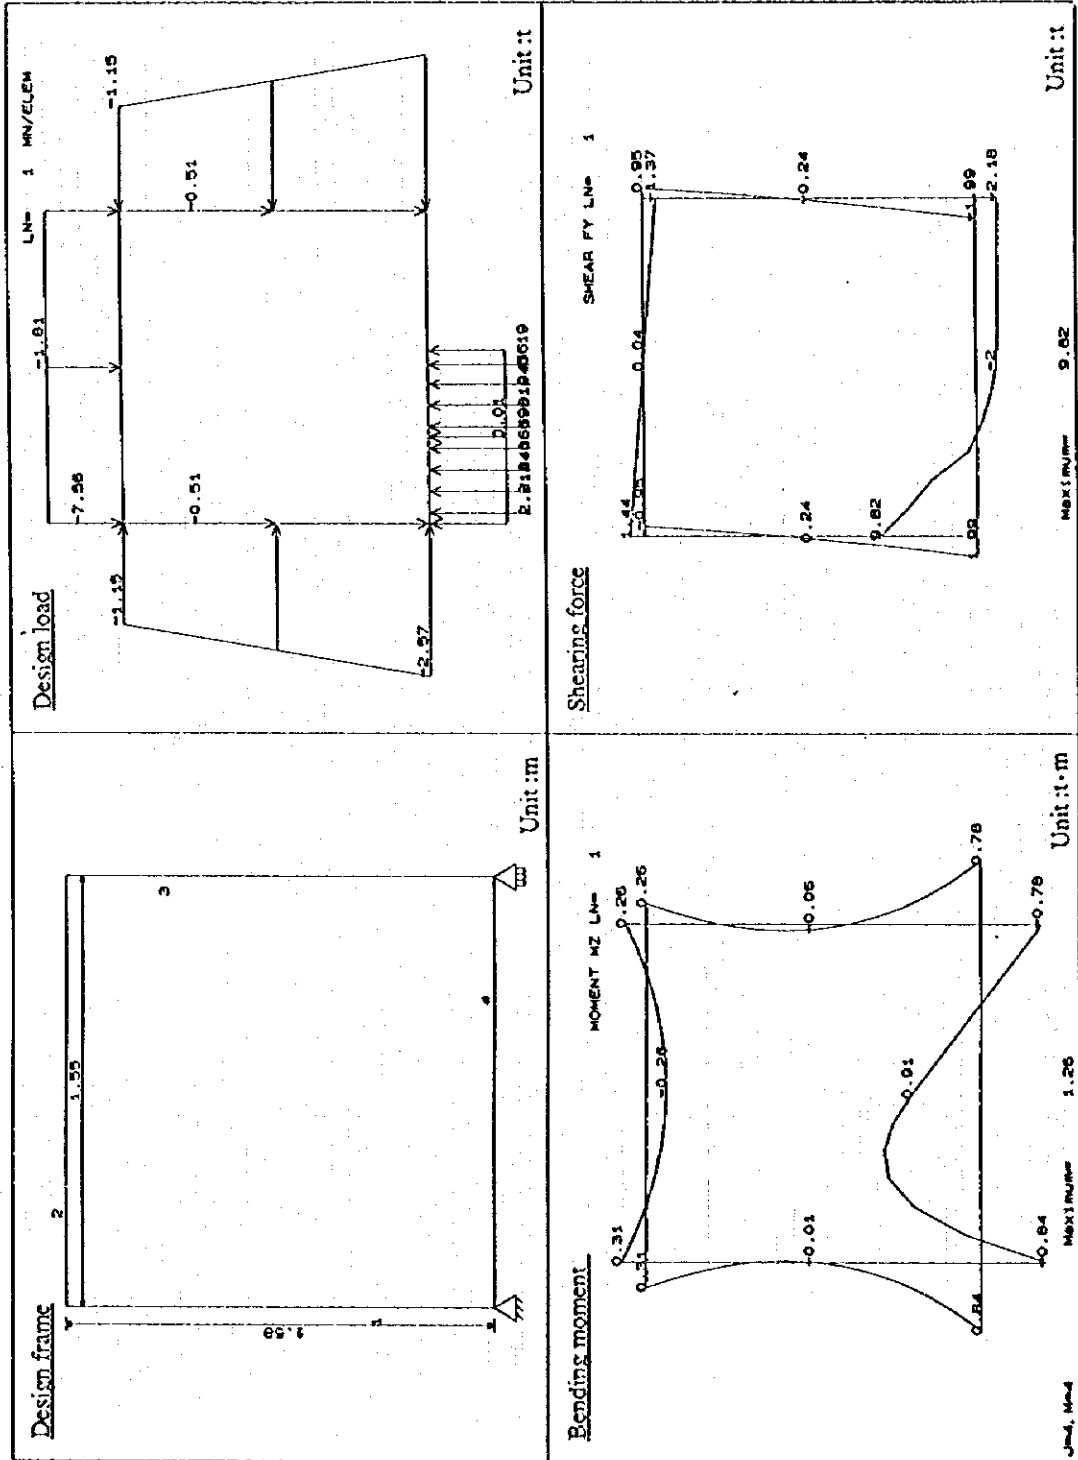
Stress Analysis on Transverse Section of Sluiceway Conduit (6/12)
